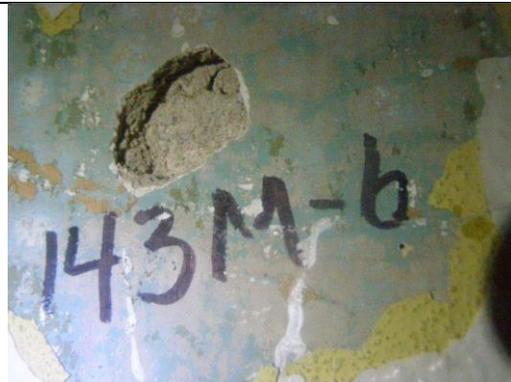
Plaster/Txt Pt. (143M-6) Kitchen, Wall B.
